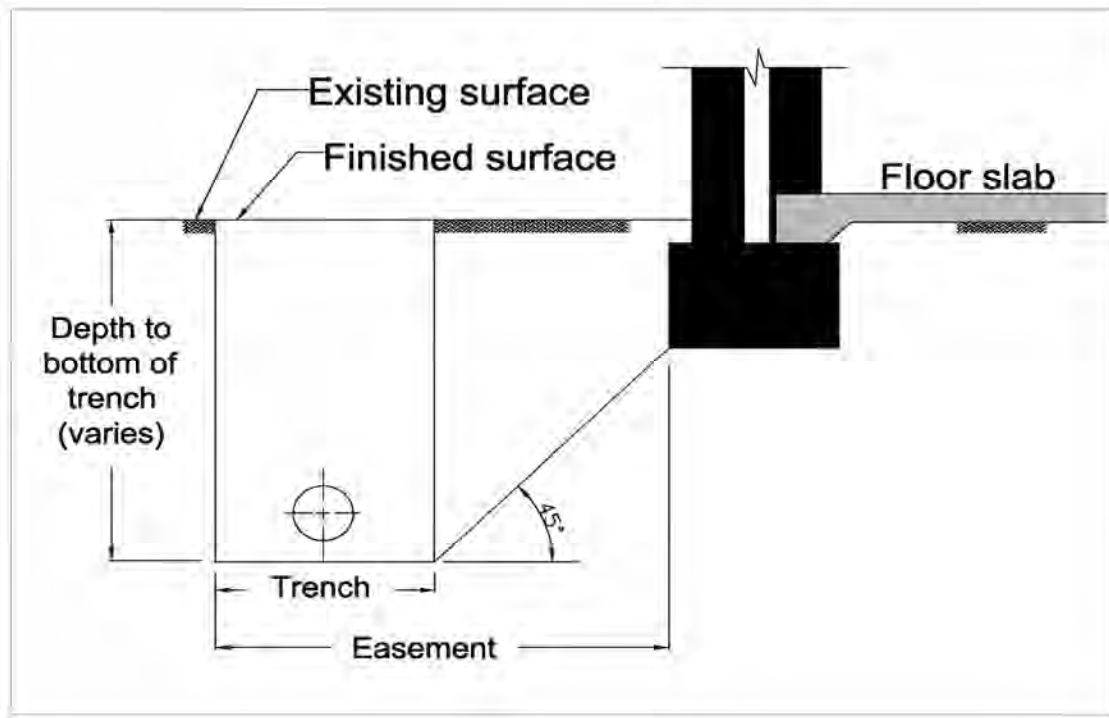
Typical Footing Detail Showing the 45o Zone of Influence
